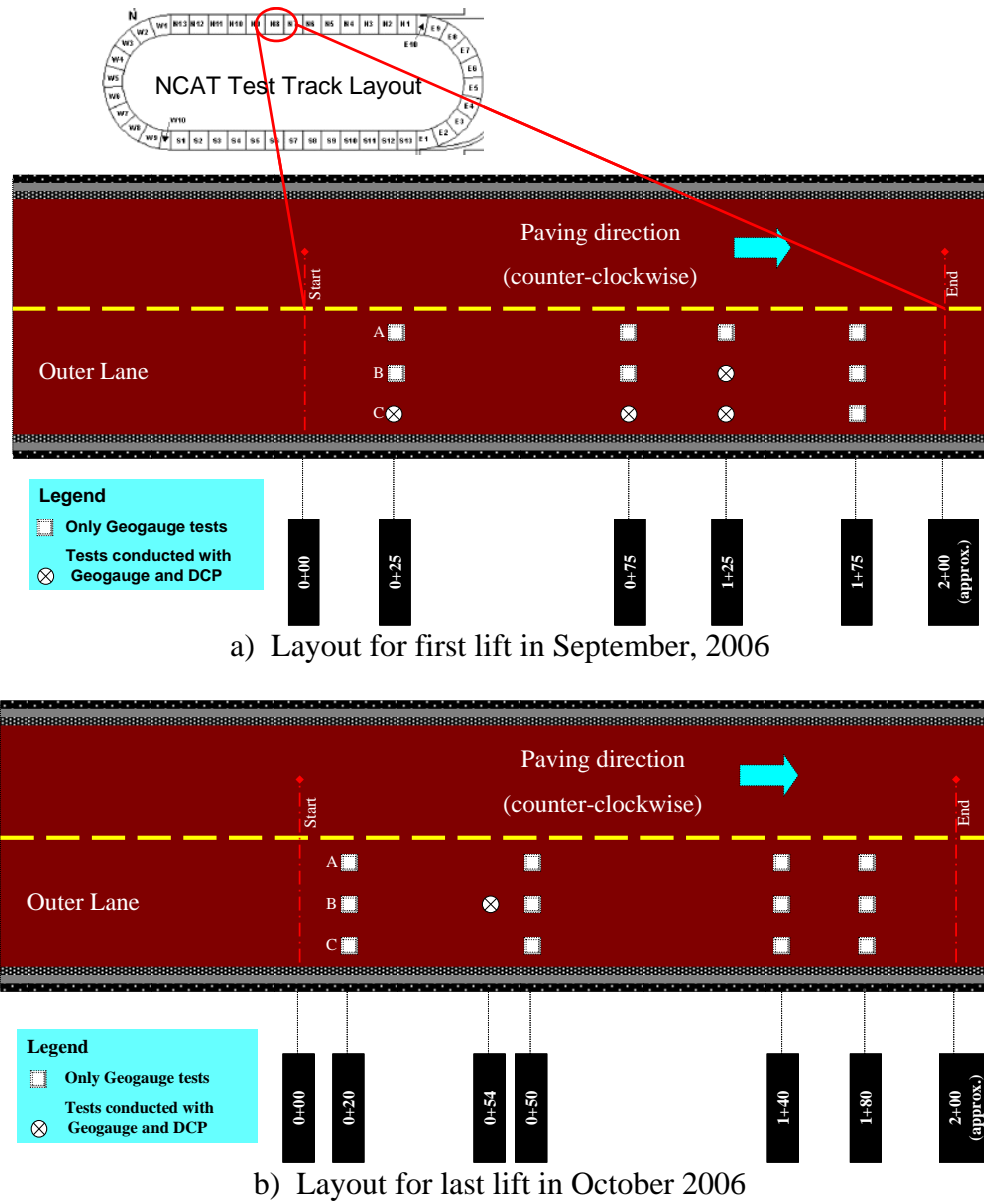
Layout of Test Points on Subgrade Section N-8 at NCAT (refer to Tables B.14 and B.15)
